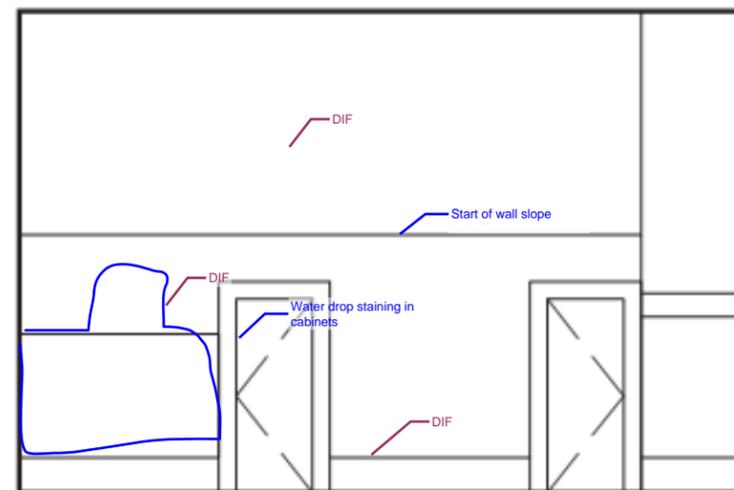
Interior Elevation, 2017. Image Courtesy of OLBN Inc.
